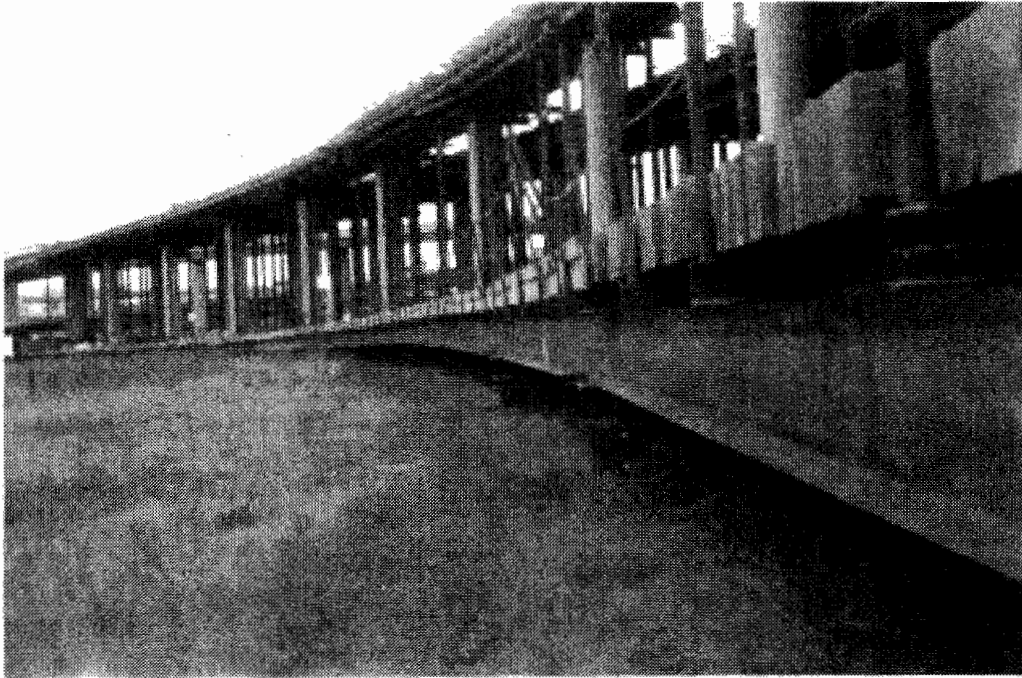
Elevated construction platform crossing seasonal wetlands at Mills Field.
